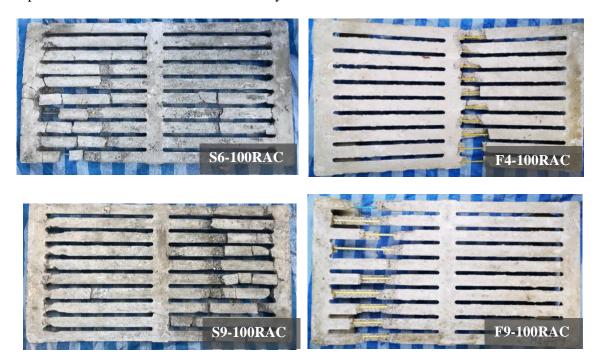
Typical failure of tested slabs (Series 100RAC).
